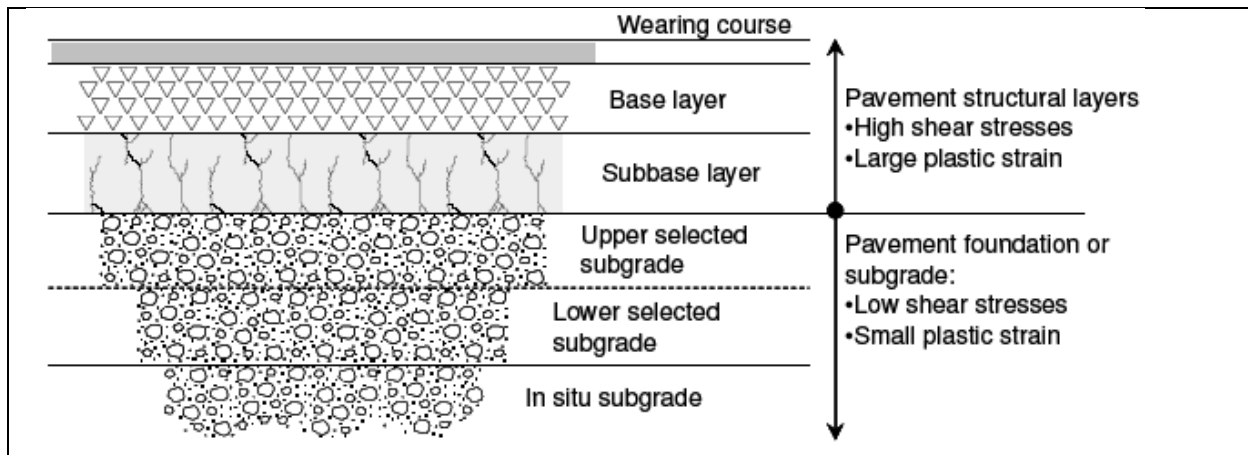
Typical South African pavement structure (Theyse, 2008a).
